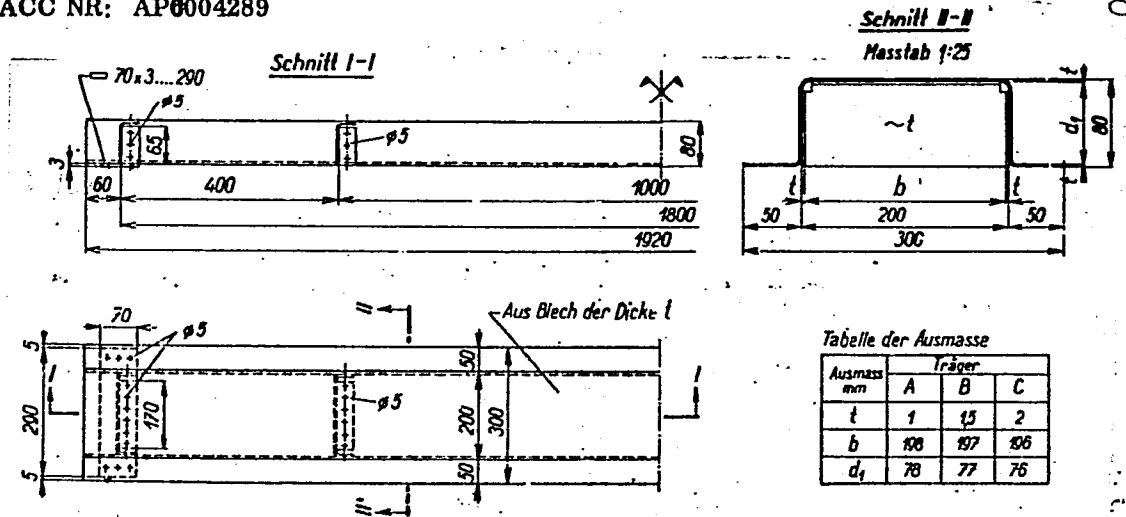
Shape and dimensions of test beams. Legend: Schnitt = section, Masstab = scale, Aus Blech... = made of plate of t thickness, Tabelle der Ausmasse = table of dimensions, Ausmass = dimension, Träger = beam
